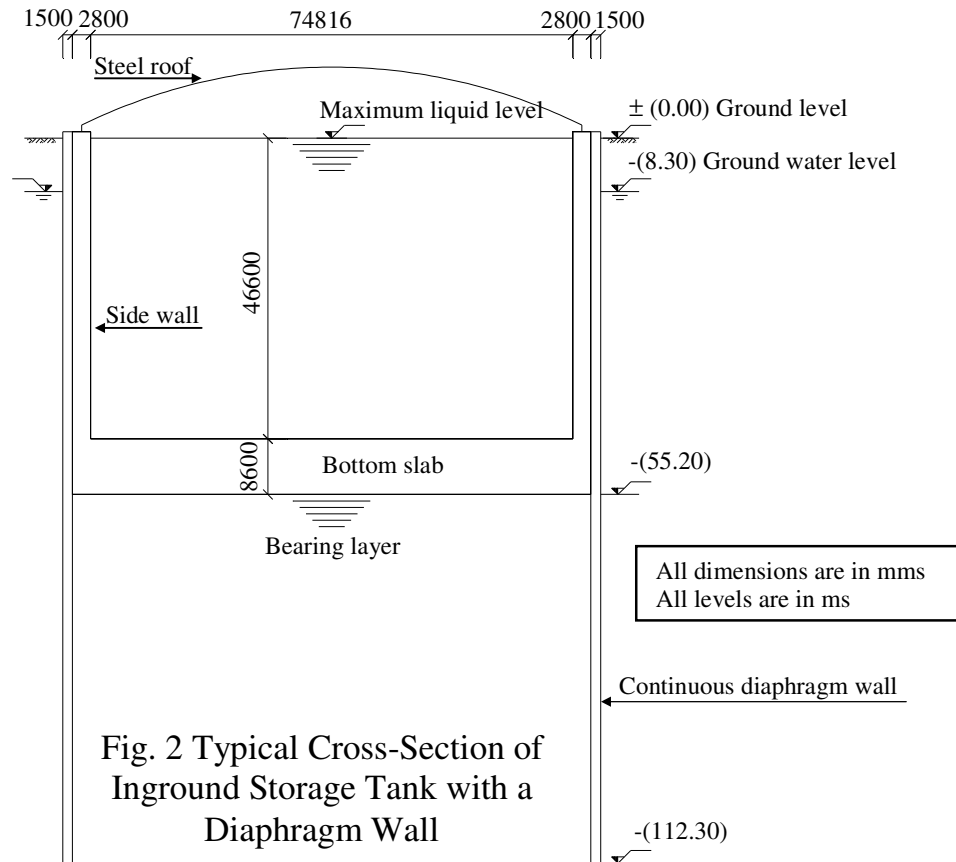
Typical Cross-Section of Inground Storage Tank with a Diaphragm Wall
